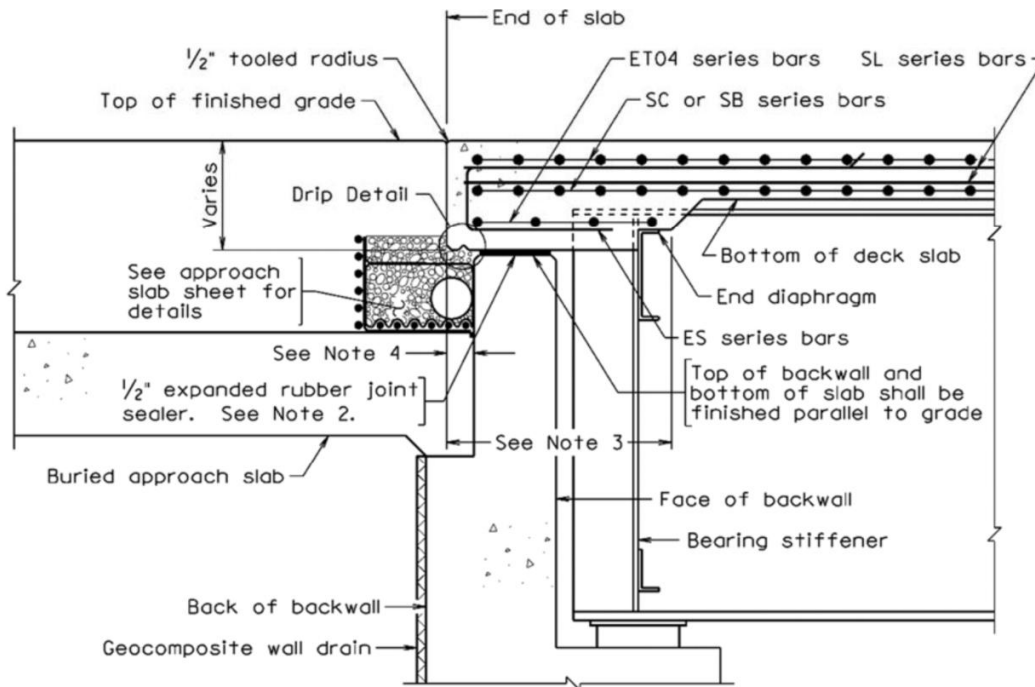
Proposed Joint Detail at the Backwall-Wingwall Interface
